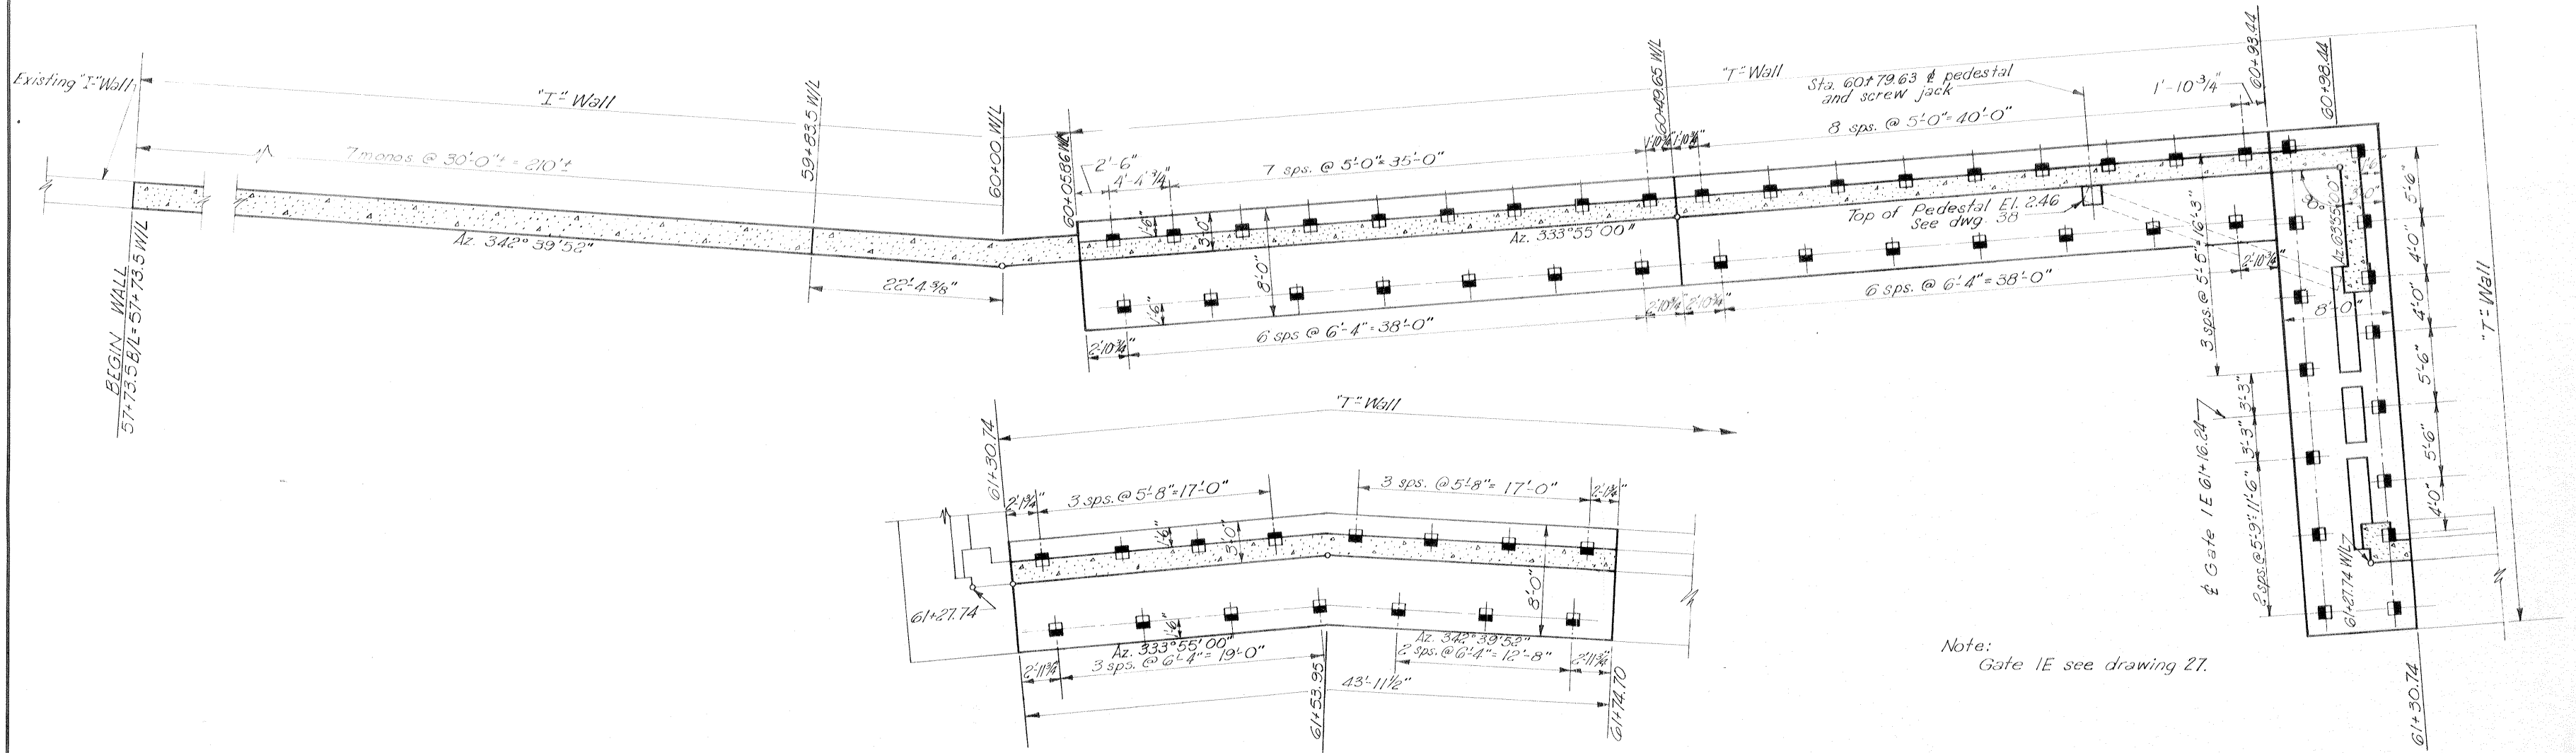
DETAIL OF PRECUT HOLES IN Z-27 SHEET PILING
